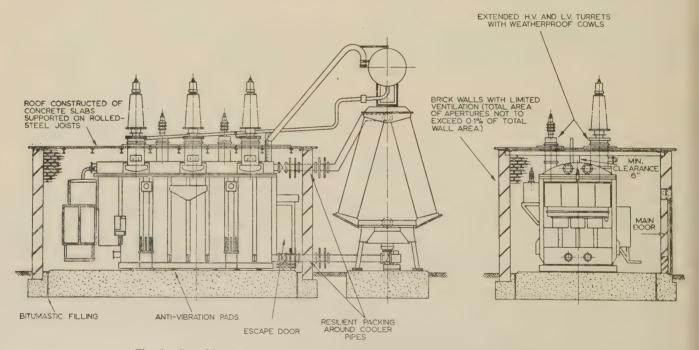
Sound insulating enclosure for a large transformer with separate cooling bank.
